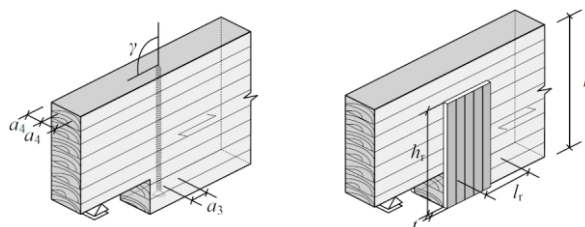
Notched beams with externally-bonded reinforcement studied by (Jockwer 2014).
